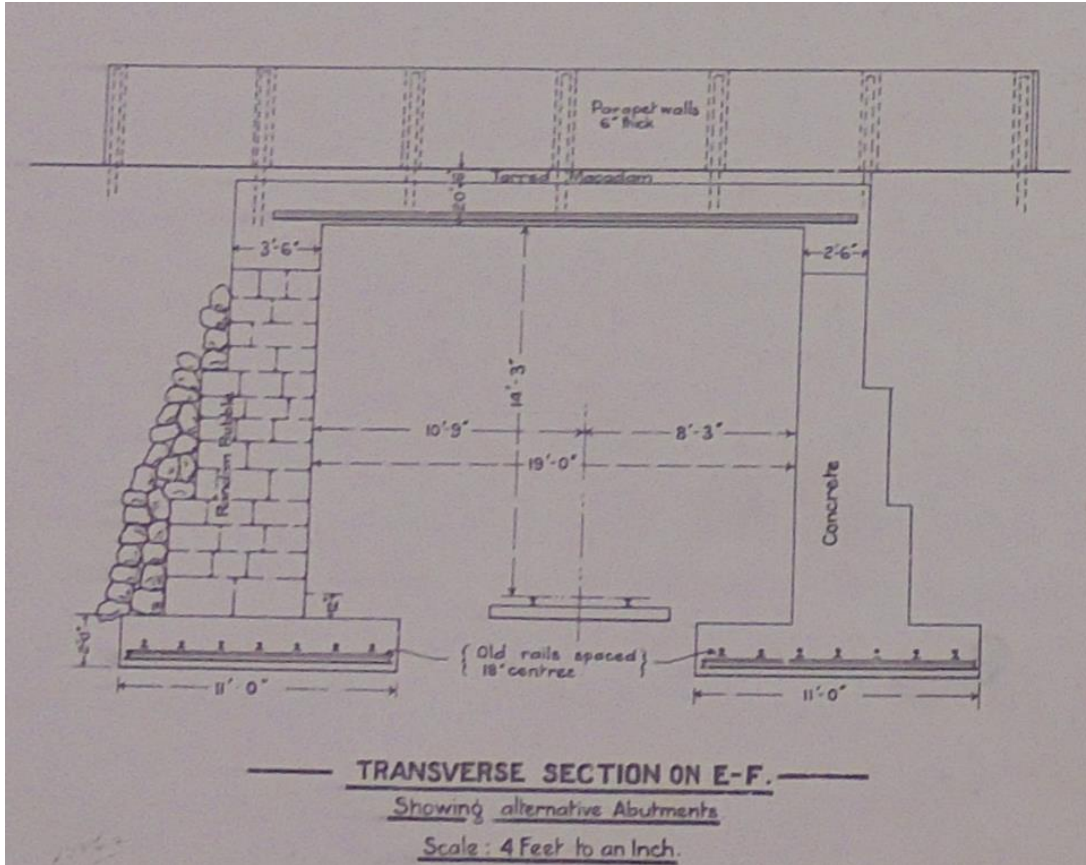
Cross Section through overbridge. National Archives, Wellington, BABJ A681 14406 Box 46, Record Number 3350, Overbridge at Māngere Road, 1914.
